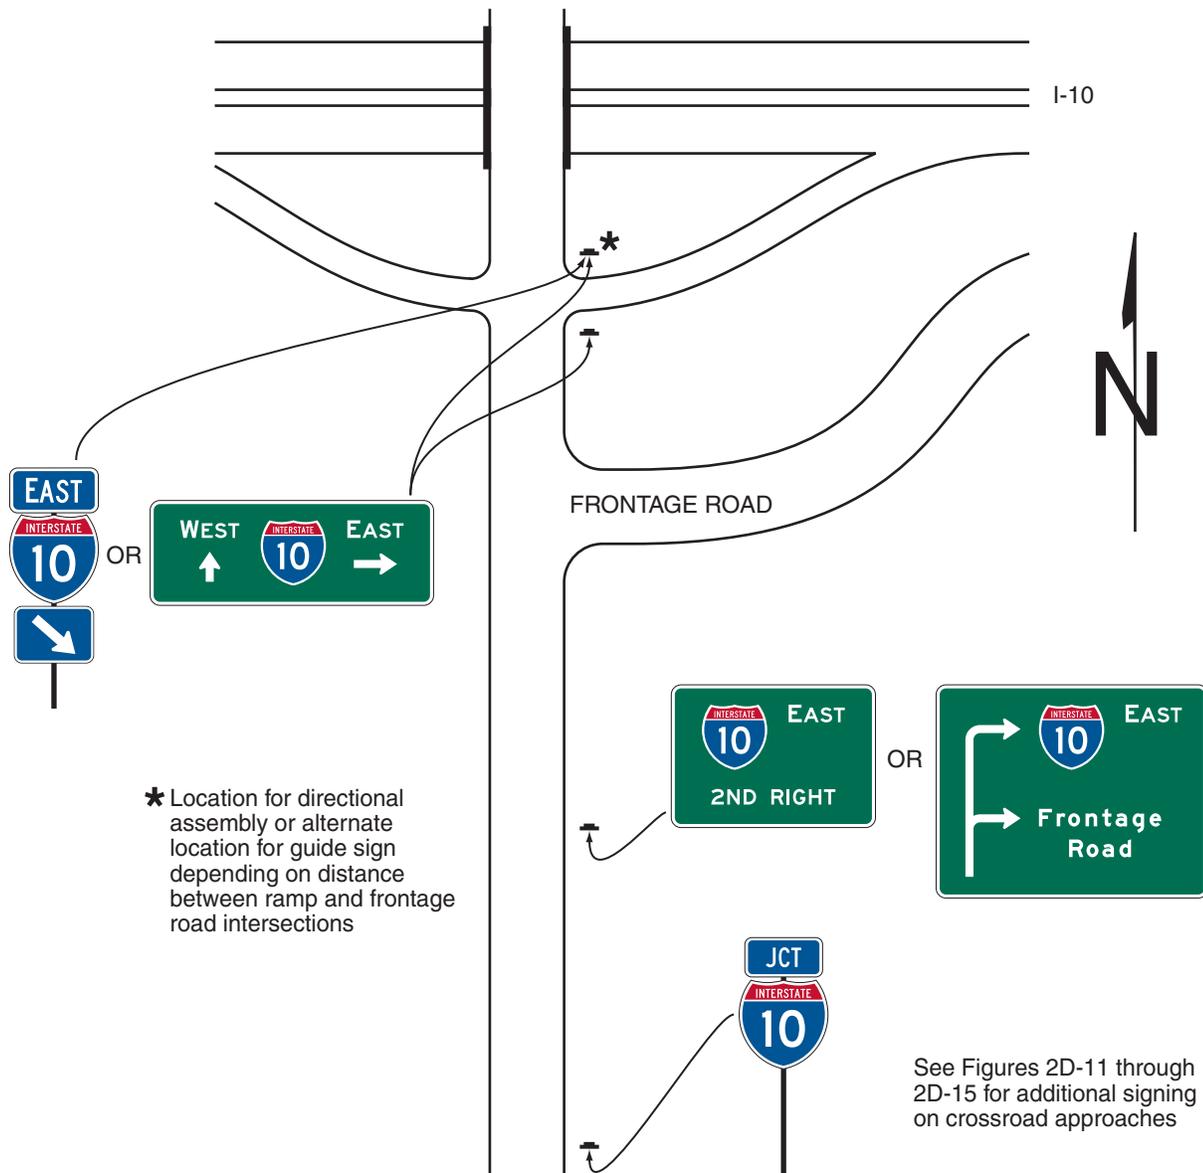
D-16. Example of Crossroad Signing for an Entrance Ramp with a Nearby Frontage Road
